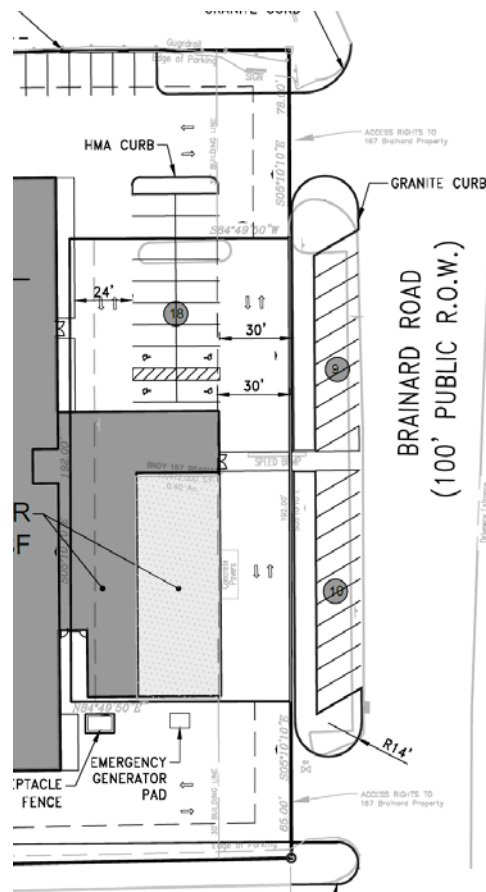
Proposed layout along Brainard Road – Pare Corporation 2022
